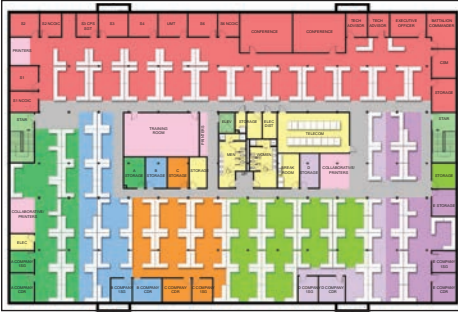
(above): Floor plan for example building used in the RTS calculation spreadsheet in Figure 2.
